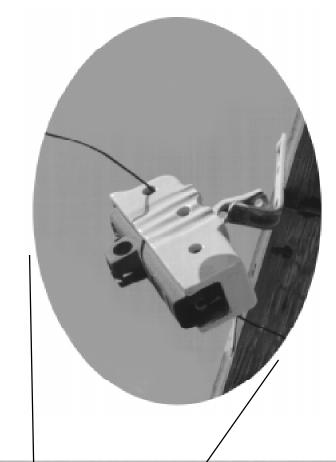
Arm Mounted Cutout with Universal Fuse
